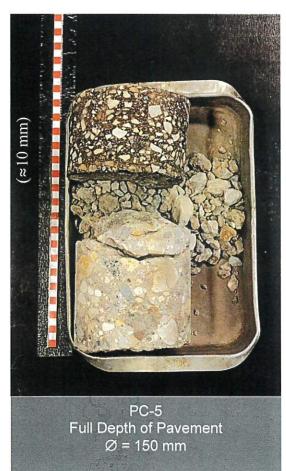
Specimen from Ellice Avenue, Westbound Curb Lane
